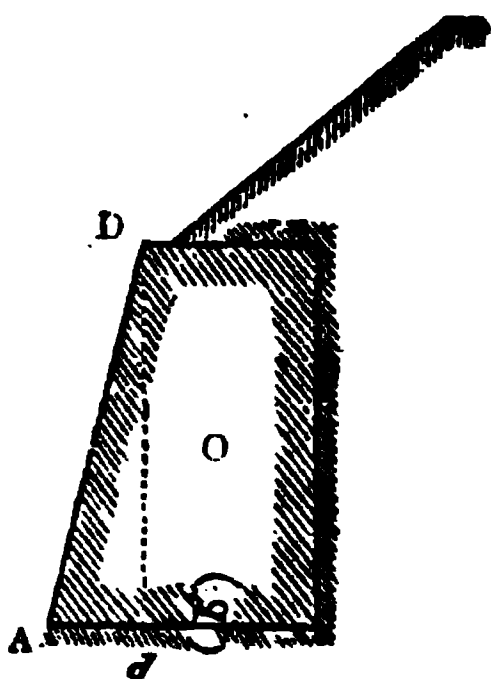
Represents a section O of a retaining wall with a sloping face AD.
